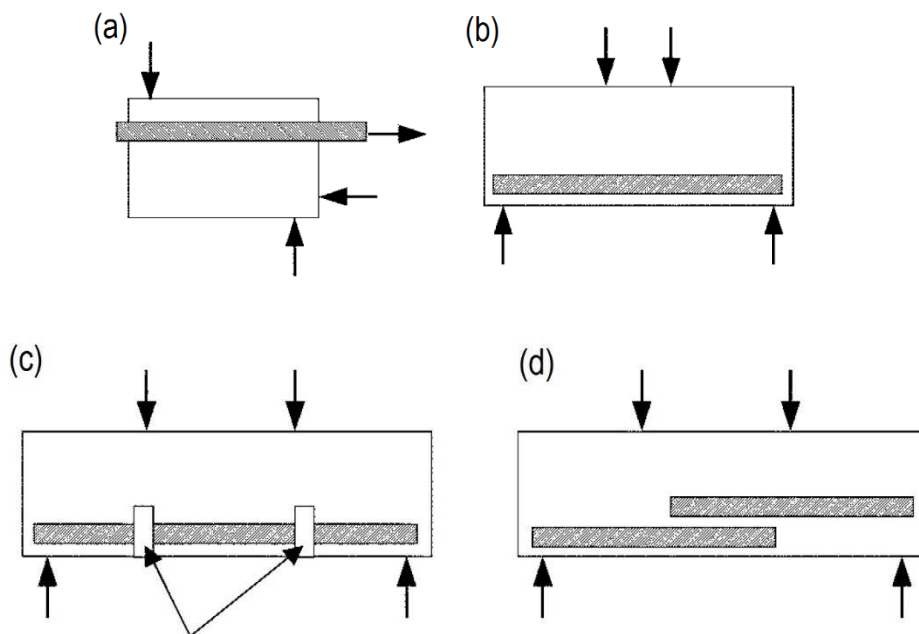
Types of beam bond test: (a) beam-end specimen (b) simple beam specimen (c) hinged beam-end specimen (d) splice specimen (ACI, 2012).
